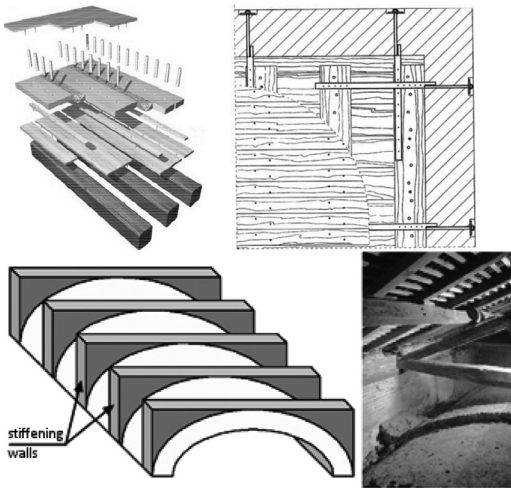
Strengthening interventions for the optimization of horizontal elements performance: (a) Wood-wood technique and detail of the connection to the walls for wooden floors; (b) stiffening elements in barrel vaults. (NIKER, WP3, Deliverable 3.2).
